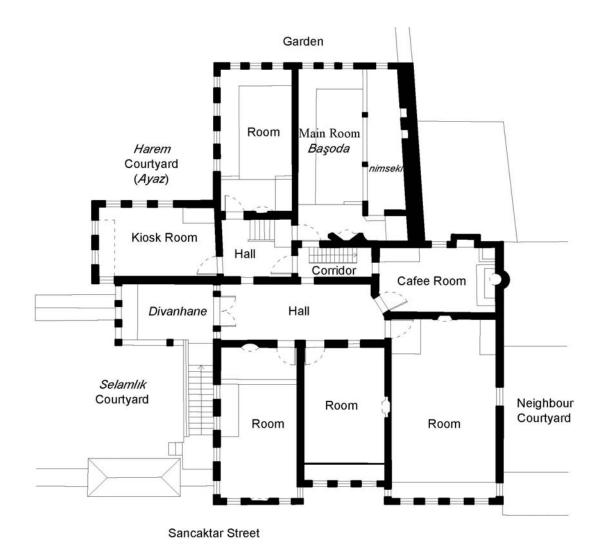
The top floor plan of Mühürdarzade House in Divriği, Sivas. (Source: Erdem, 2014)
